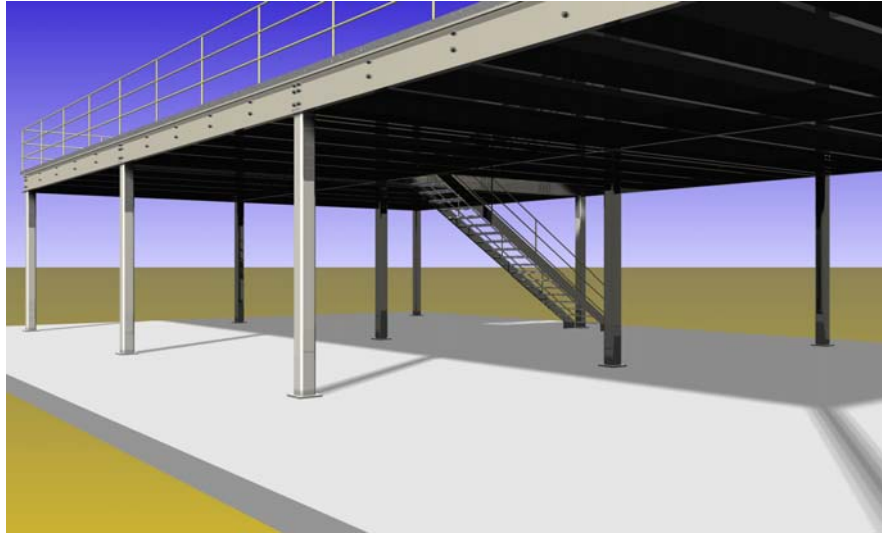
TYPICAL CFS-SBMF USED AS INDUSTRIAL PLATFORM MEZZANINE
